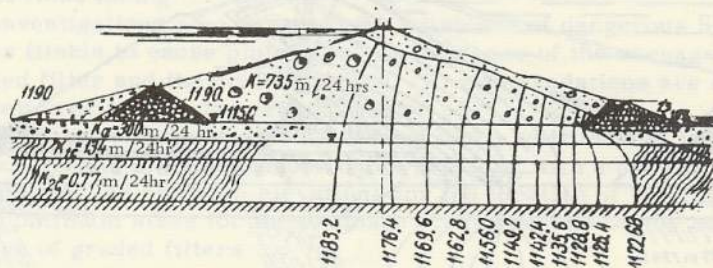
Equipotential lines in the cross section of the dam made of gravel soil
